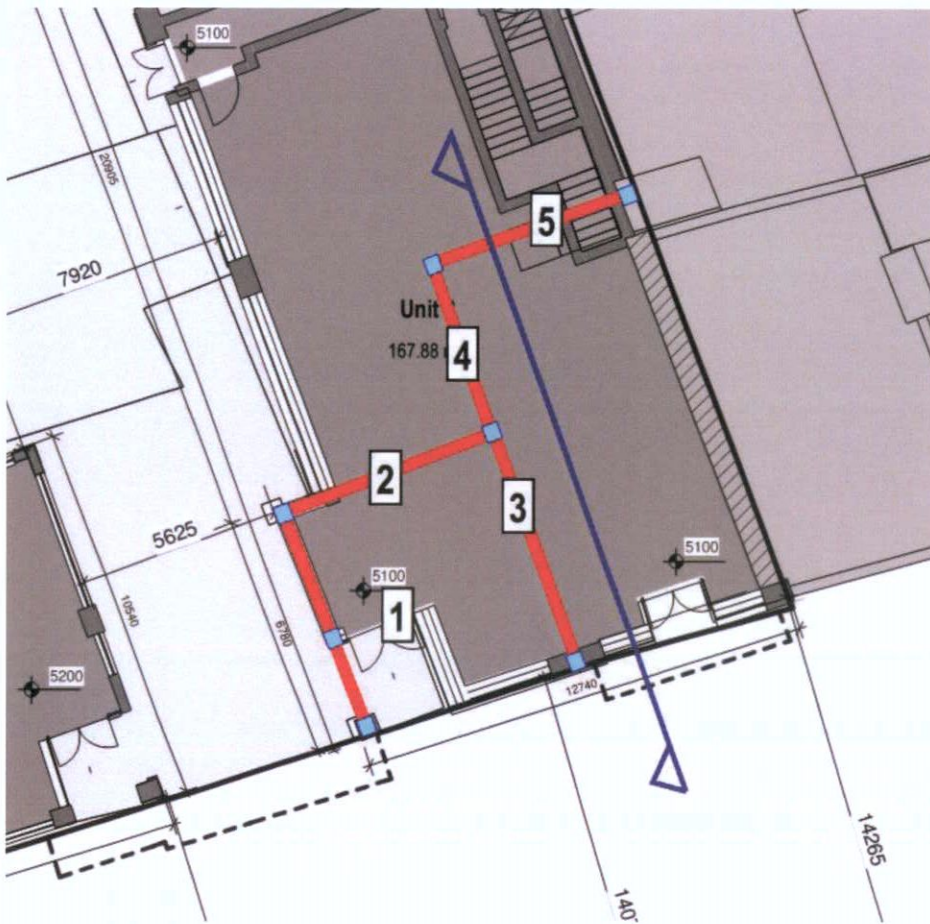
36-37 Henry Street New Steel Layout Ground Floor
